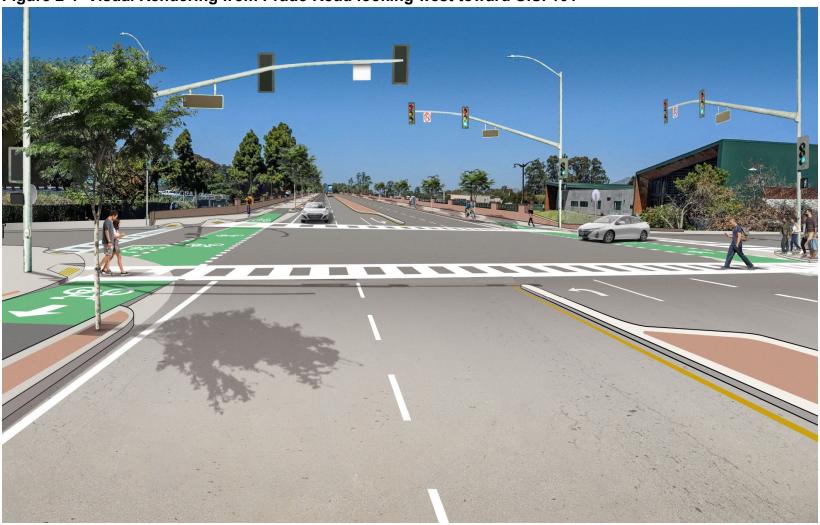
Visual Rendering from Prado Road looking west toward U.S. 101
